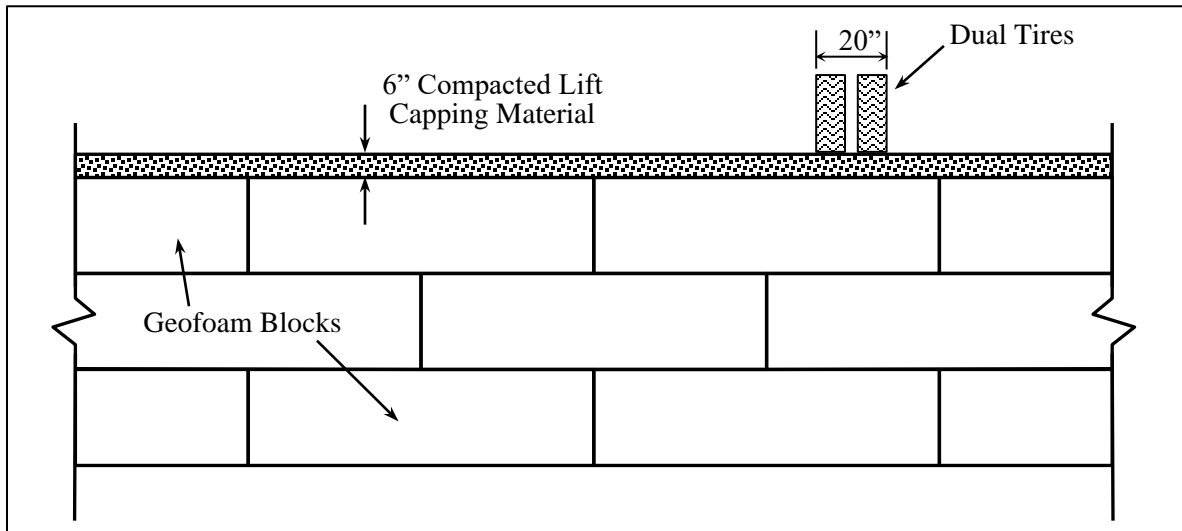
Typical Geofoam Embankment Section after Placement of 6 Inch Capping Material
